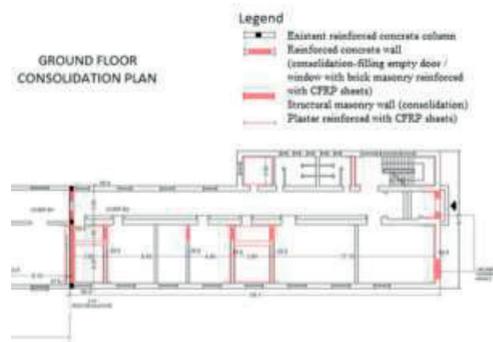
A part of consolidation plan for the ground floor (proposal). Existing reinforced concrete column; Reinforced concrete wall (consolidation-filling empty door / window with brick masonry reinforced with carbon fiber reinforced polymer/CFRP sheets); Structural masonry wall (consolidation); plaster reinforced with CFRP sheets)
